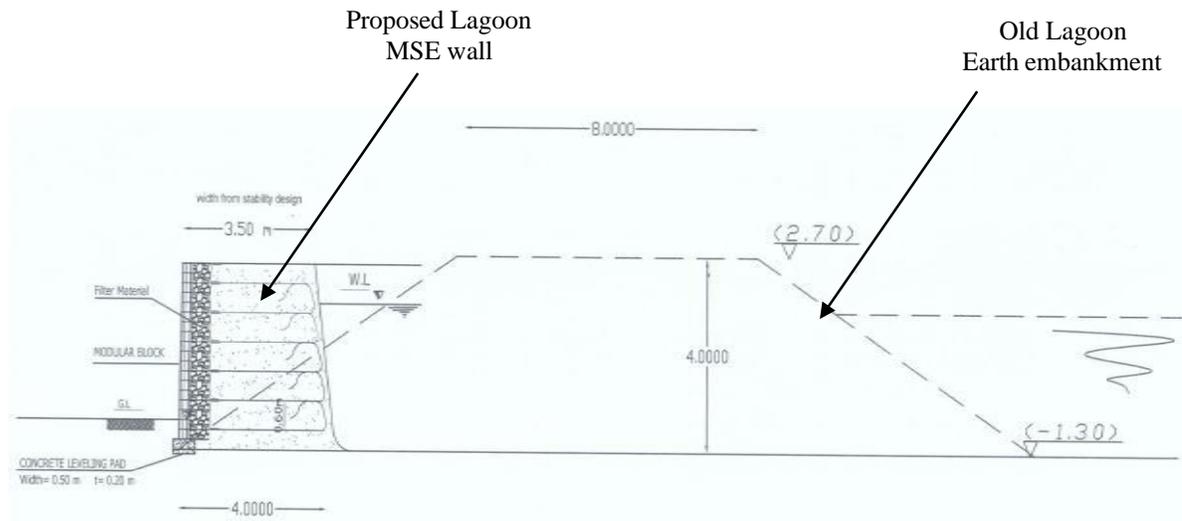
Section shows comparison between the geometry of the proposed MSEW and traditional embankment existing earth wall
